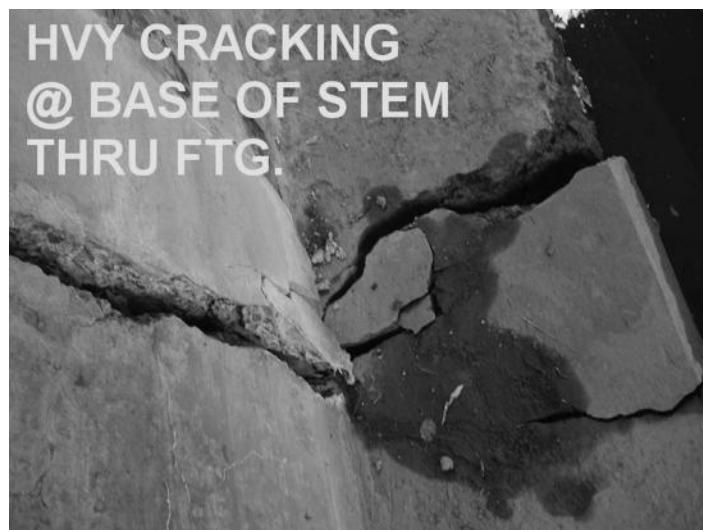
Red Flag due to serious cracking of abutment stem. (Courtesy of the New York State Department of Transportation.)
